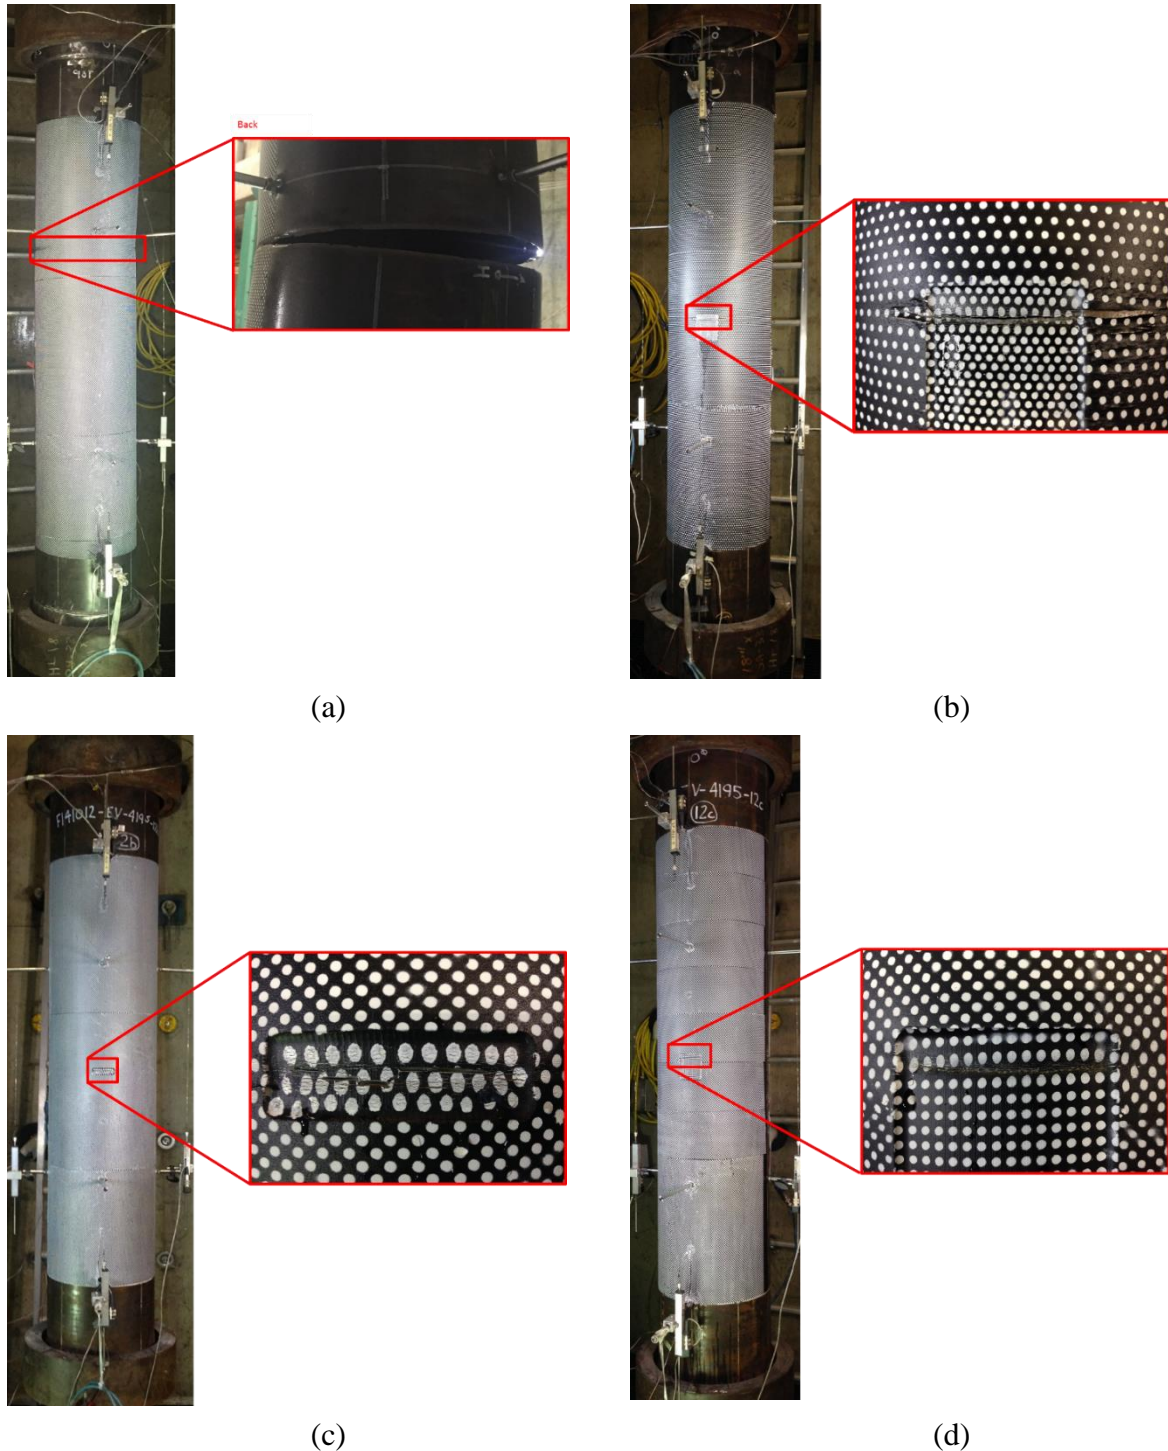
Test End Condition for Task 12 Specimens with and without Metal Loss: (a) Specimen 12 Baseline; (b) Specimen 12.a; (c) Specimen 12.b; (d) Specimen 12.c
